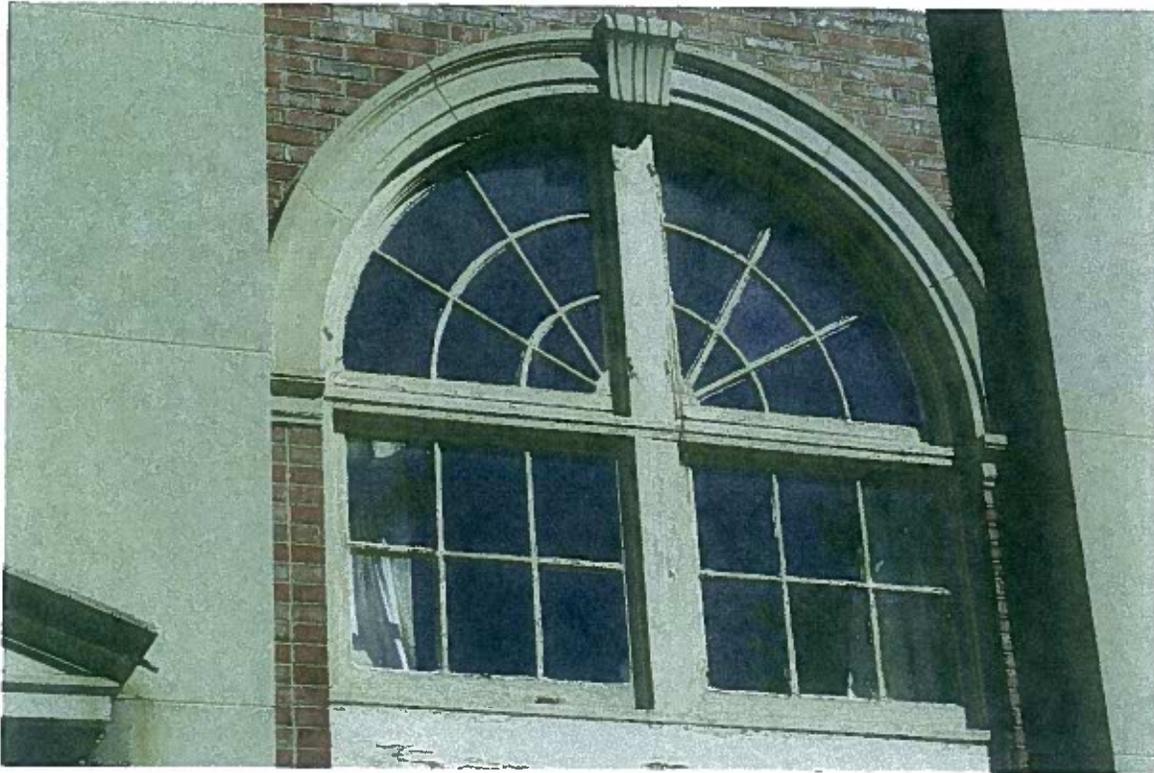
Water damage and peeling paint at original wood windows.
